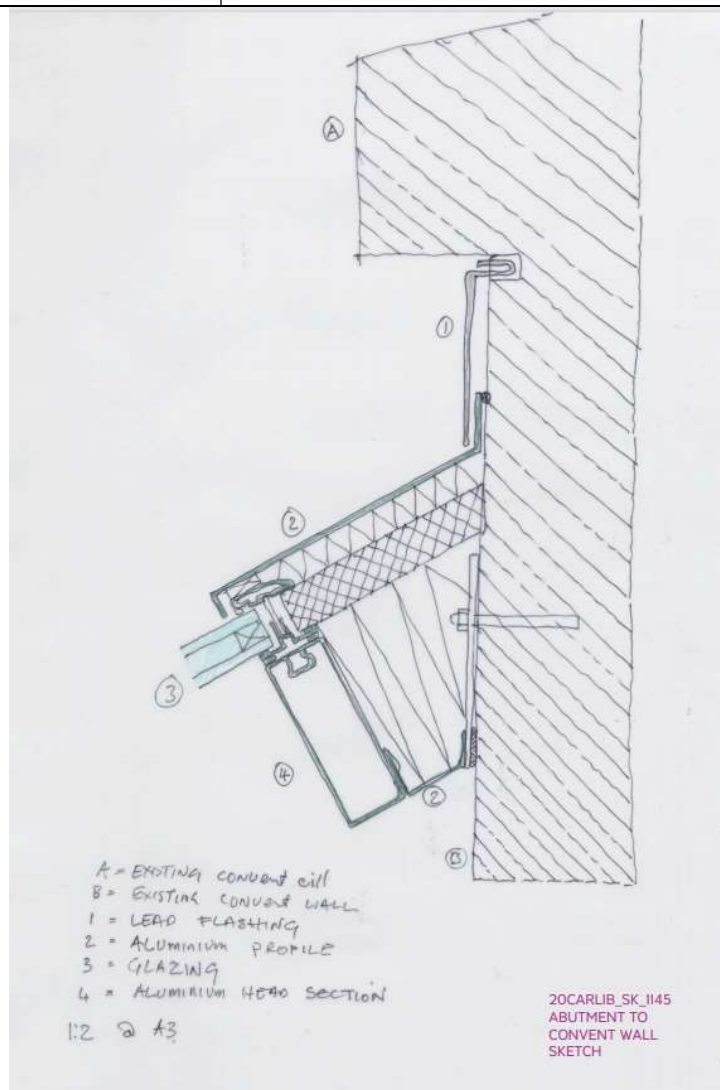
Drawing of Connection of New Extension and North Elevation of Convent by Carr, Cotter, Naessens
